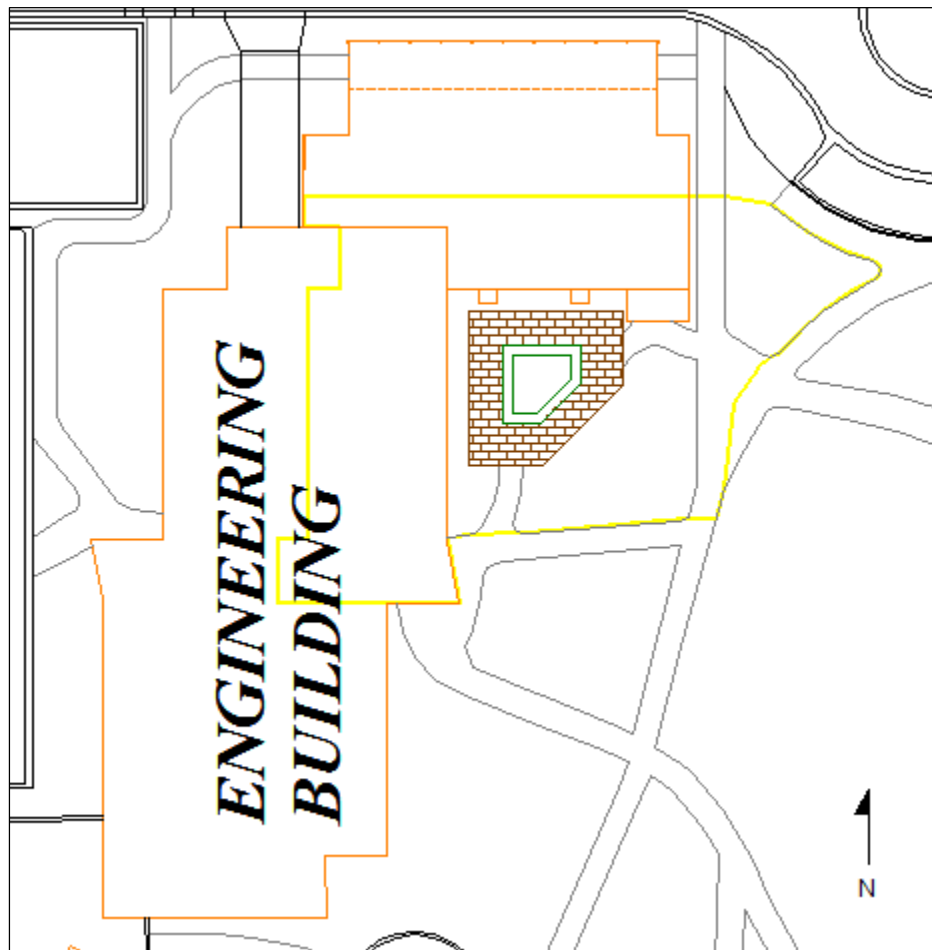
Rain Garden Contributing Drainage Area (Outlined in Yellow)
